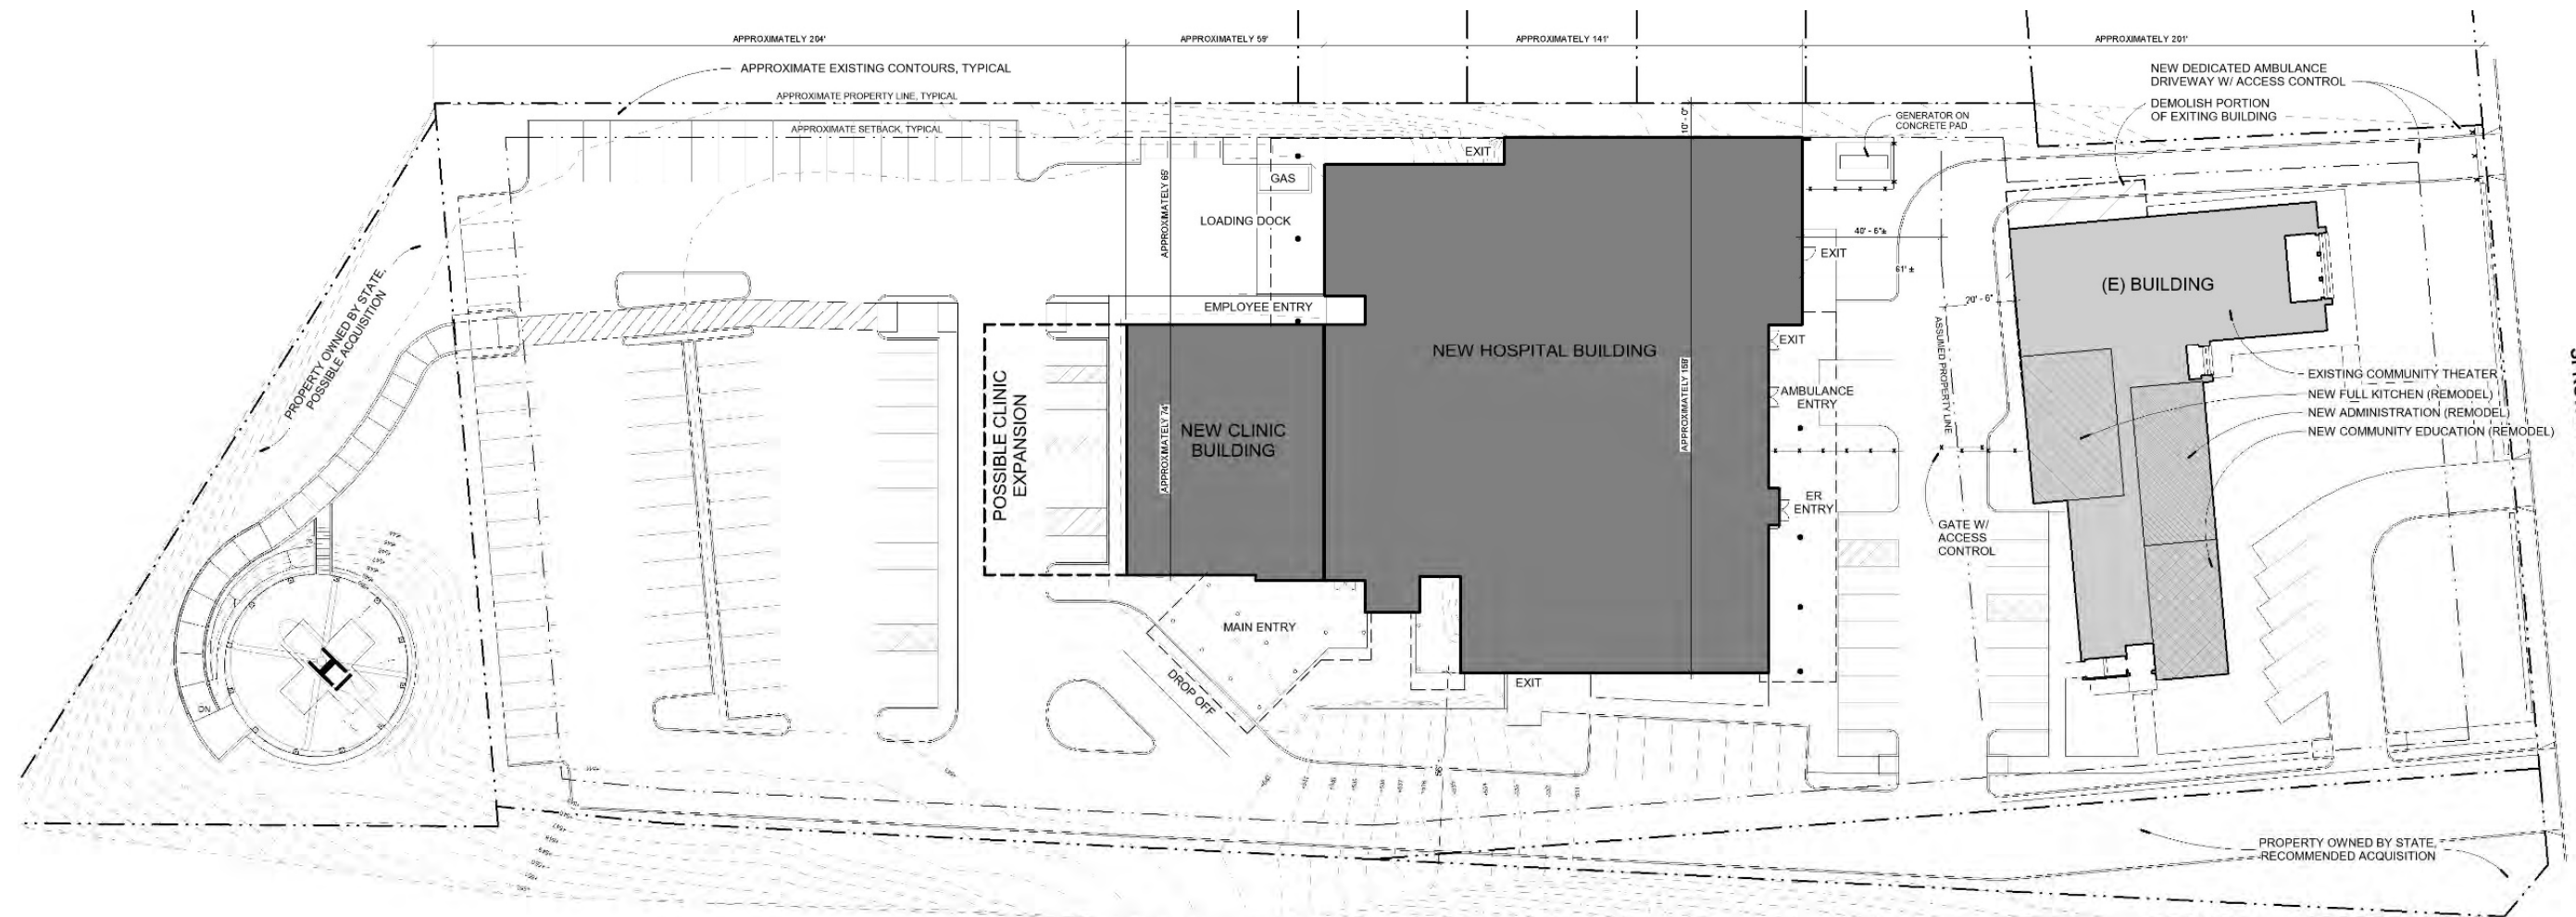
Draft Site Plan, Plausible Layout, and Size
